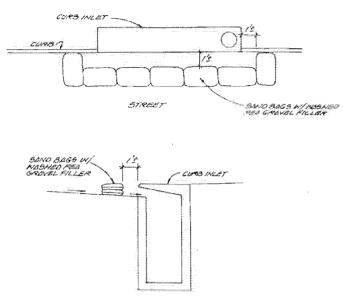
Diagram of Bagged Gravel Curb Inlet Protection (Pape-Dawson).
